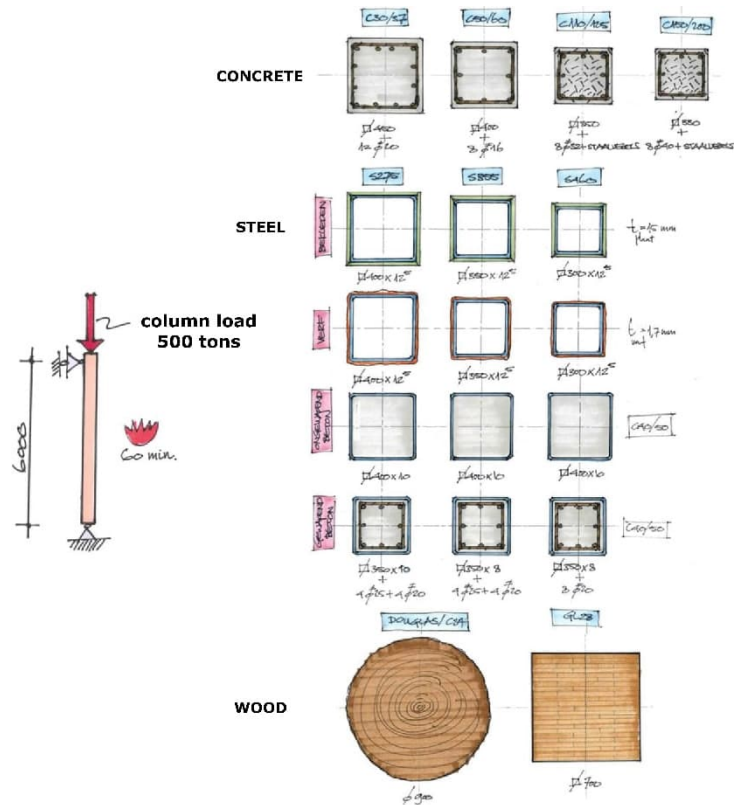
study environmental impact column variants in concrete, steel and wood of a pendulum column (l=6.0m)
